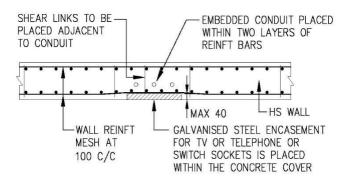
(f) DETAILS OF HS WALL REINFORCEMENT BAR NEAR HS DOOR
